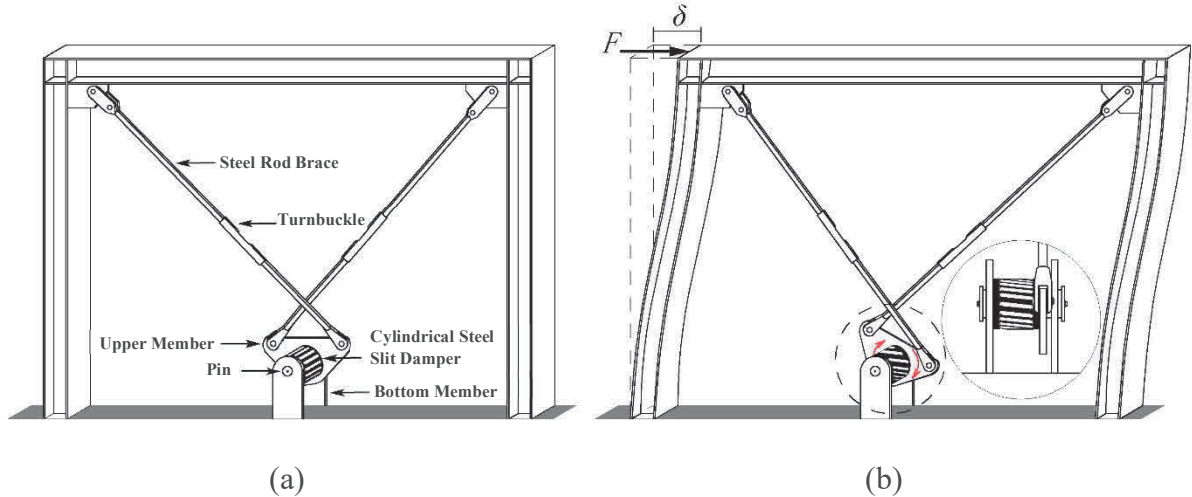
Geometric design of cylindrical steel slit damper.
